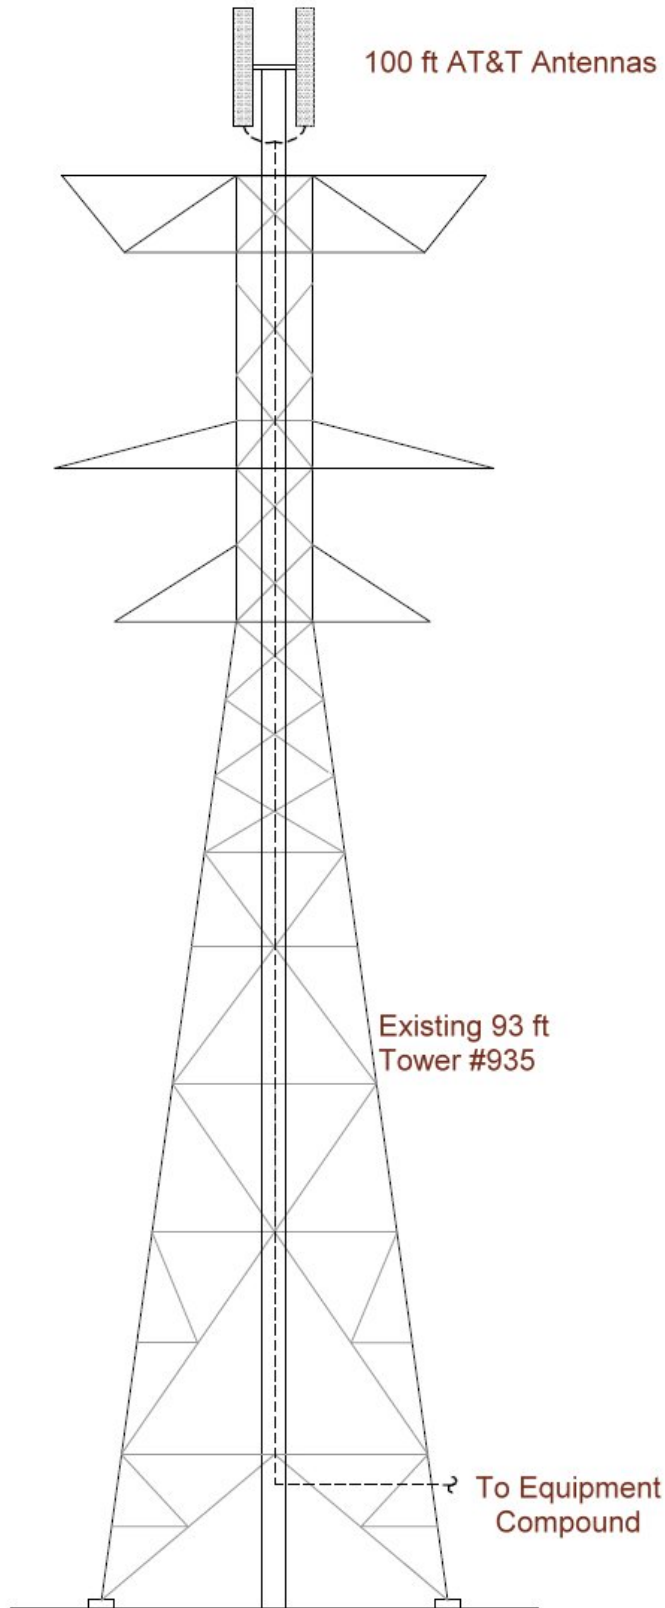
Plan Showing the Proposed Elevation Layout of the Site
